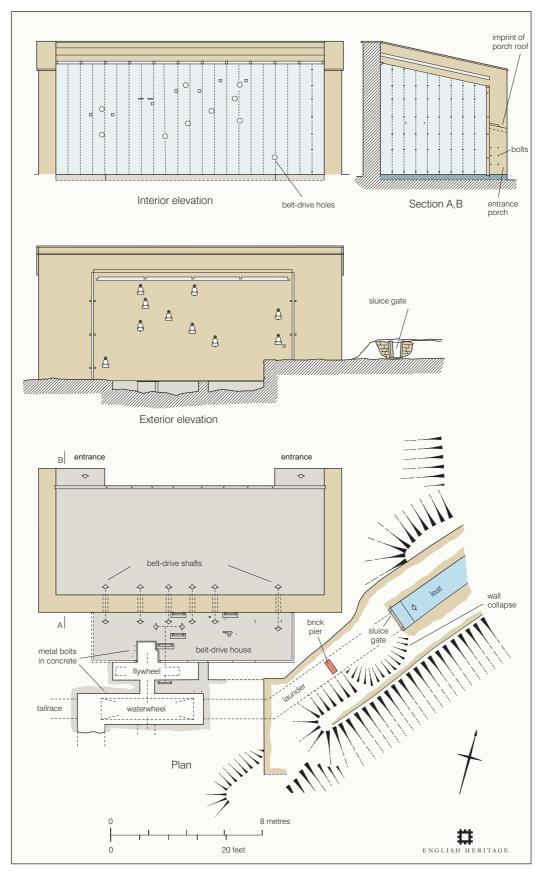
EH plan and elevations of the lower corning house mark IV (see page xiv for key to conventions).
